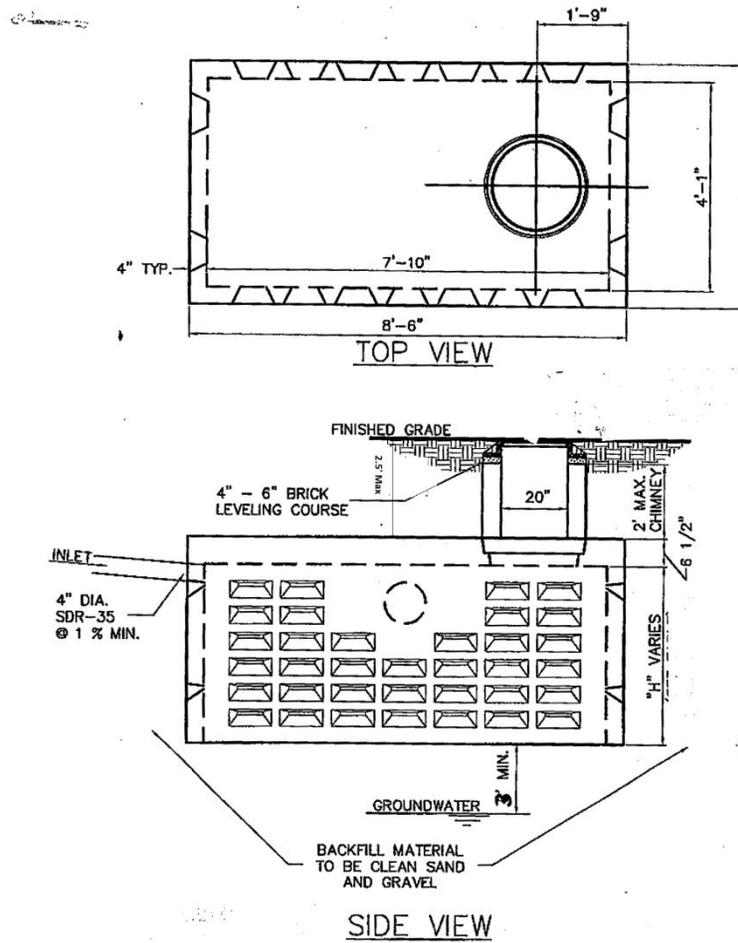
CONCRETE LEACHING POOL ARRANGEMENT/LAYOUT
